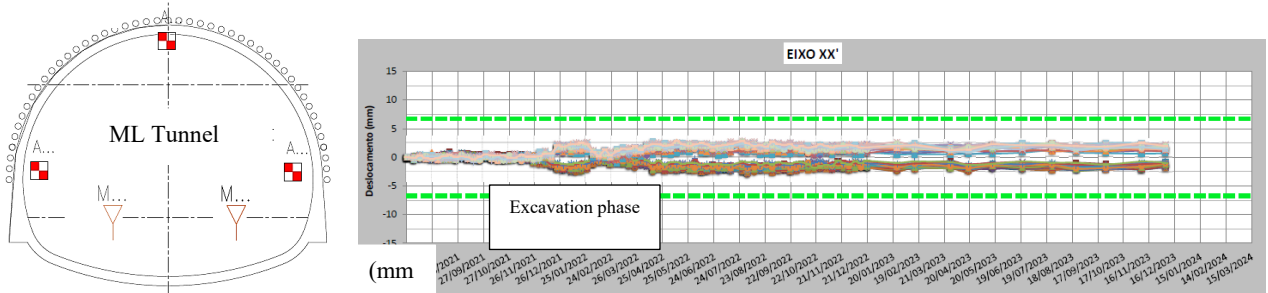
ML Tunnel – Topographic longitudinal settlements of the vault (mm).
